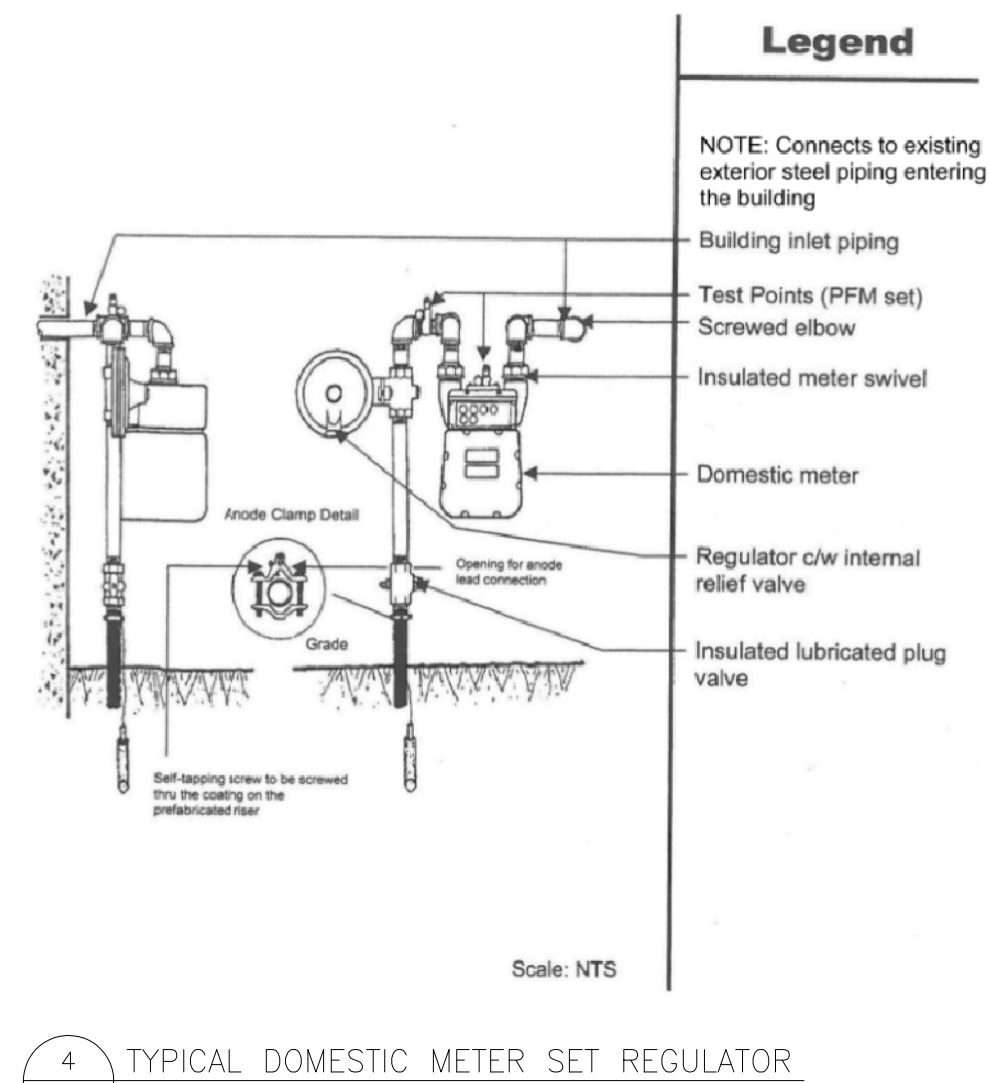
TYPICAL RISER ASSEMBLY
